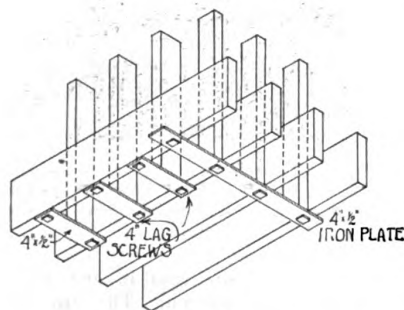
A method of setting studs to avoid settlement. The right hand side illustration shows the method where partitions run across joists, the left hand side the method used when the partition is parallel to the joists; 4 in. x 1 1/2 in. iron plates are fastened to the under side of joists, the studs without settlement.
